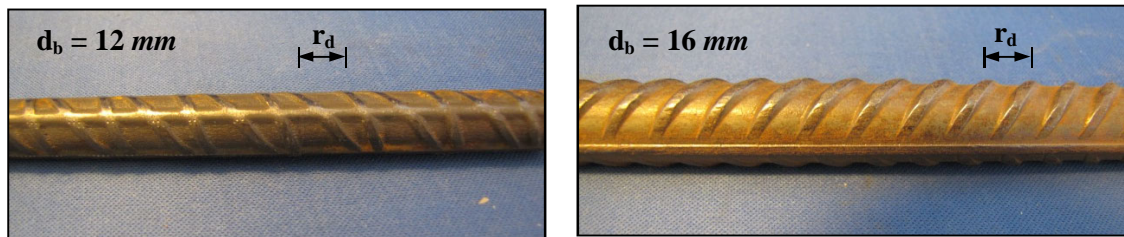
Geometry and types of reinforcing bars used in the beams
